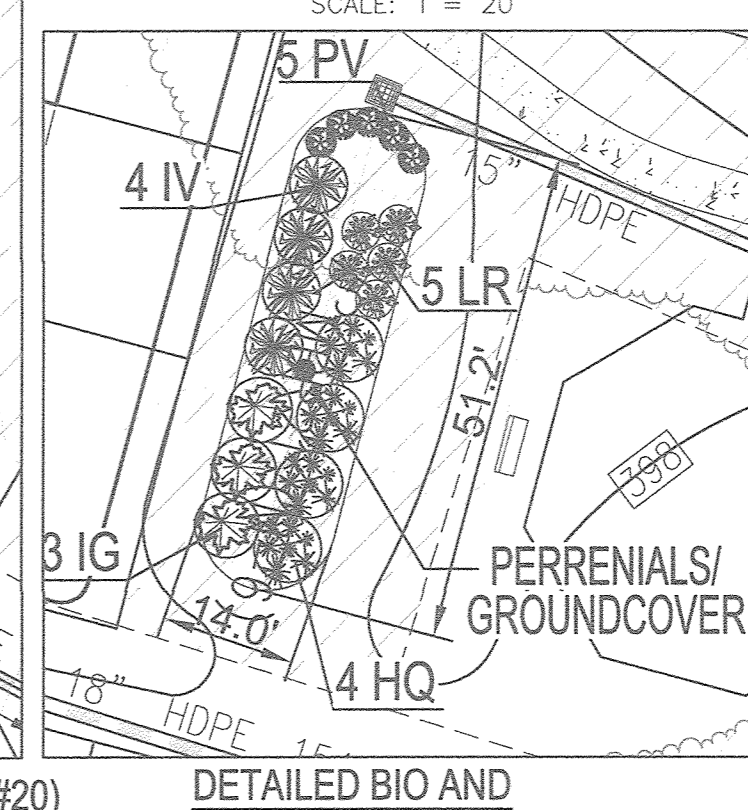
DETAILED BIO AND PLANTING PLAN (SWM #18)
